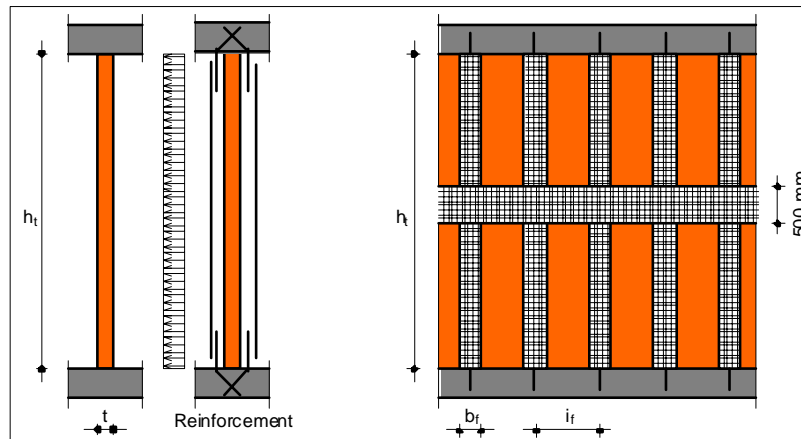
Reinforcement configuration of a partition wall with FRCM.
